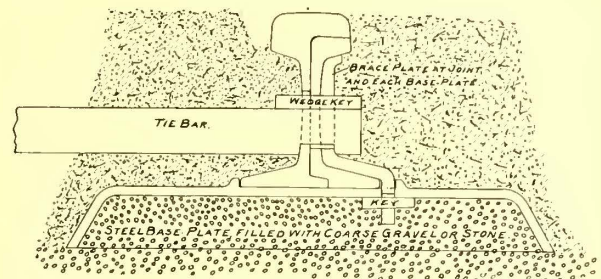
CROSS SECTION OF T RAIL AT BASE PLATE
